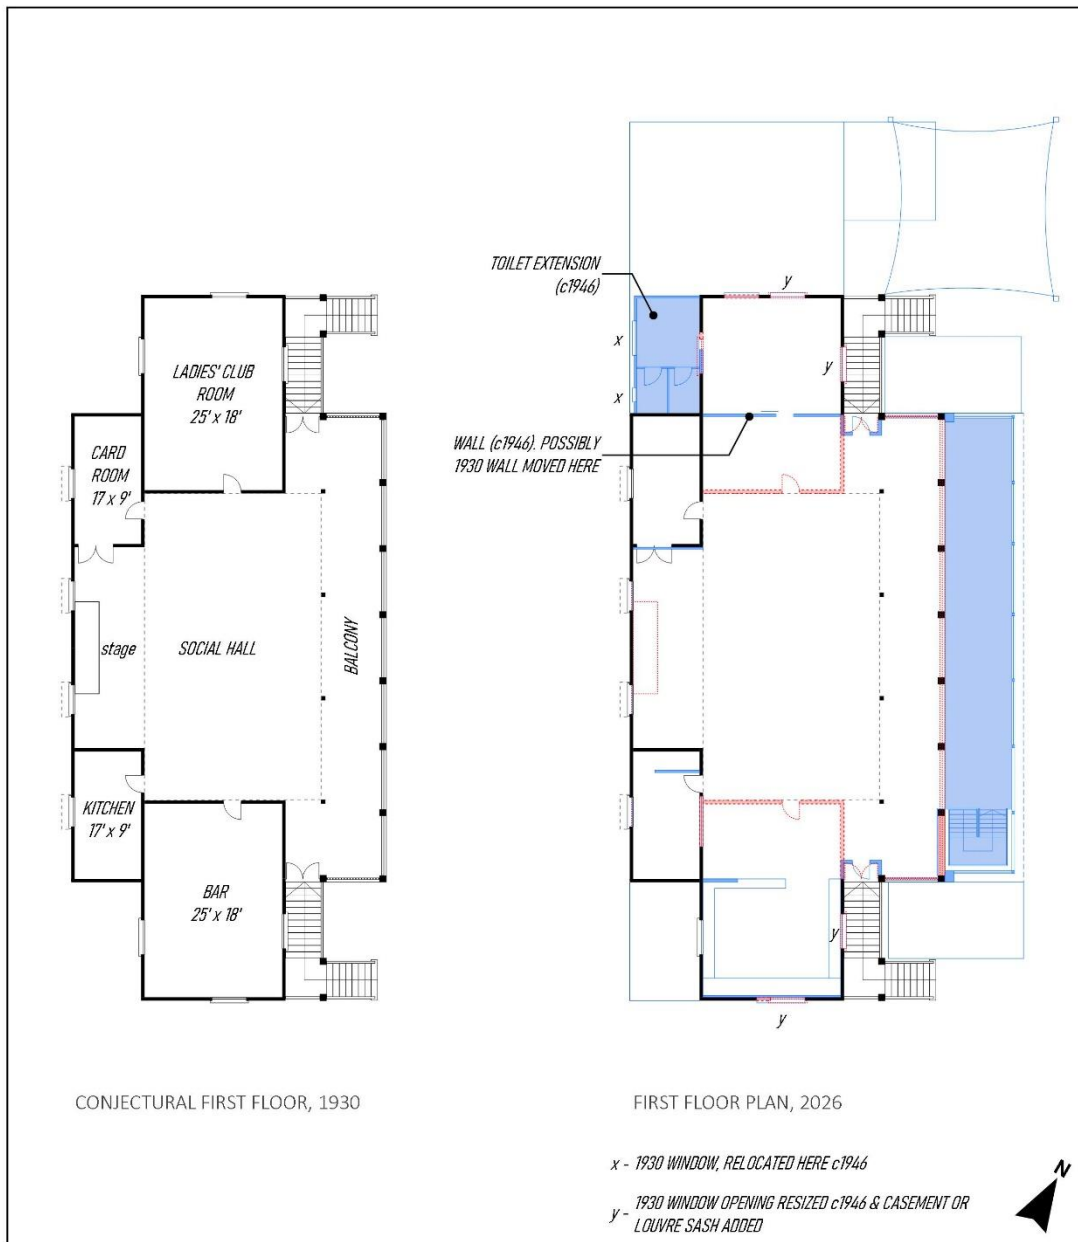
Indicative floor plan, first floor (Queensland Government, 2026)
